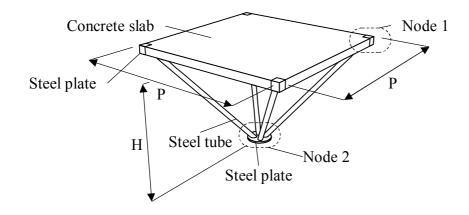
The steel-concrete space units of the steel and concrete composite cable space frame
